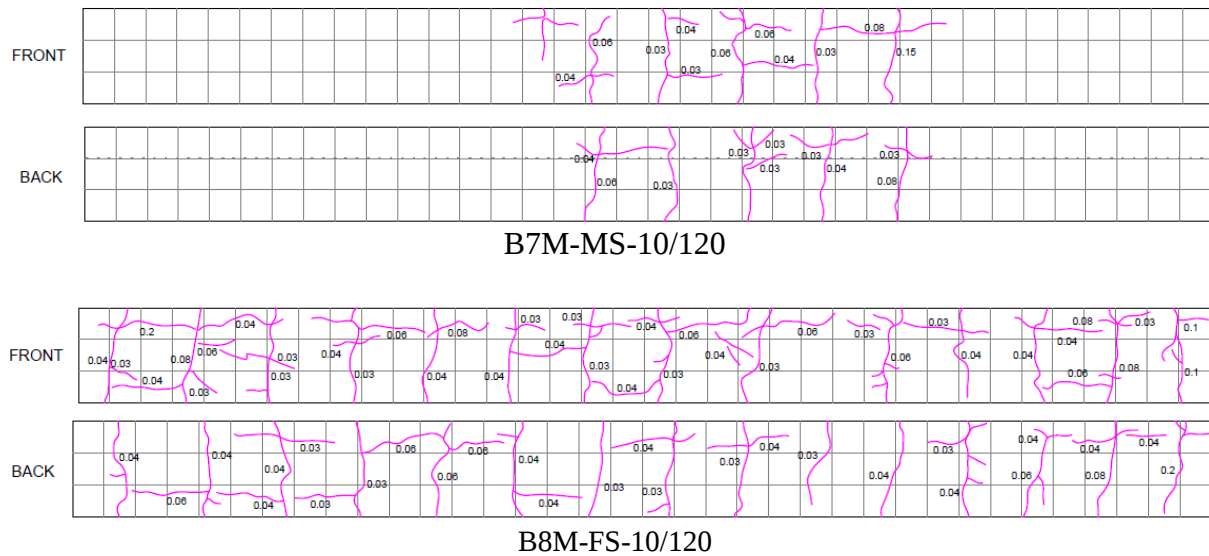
Corrosion cracks distribution of D10, 120 mm beams mildly corroded
